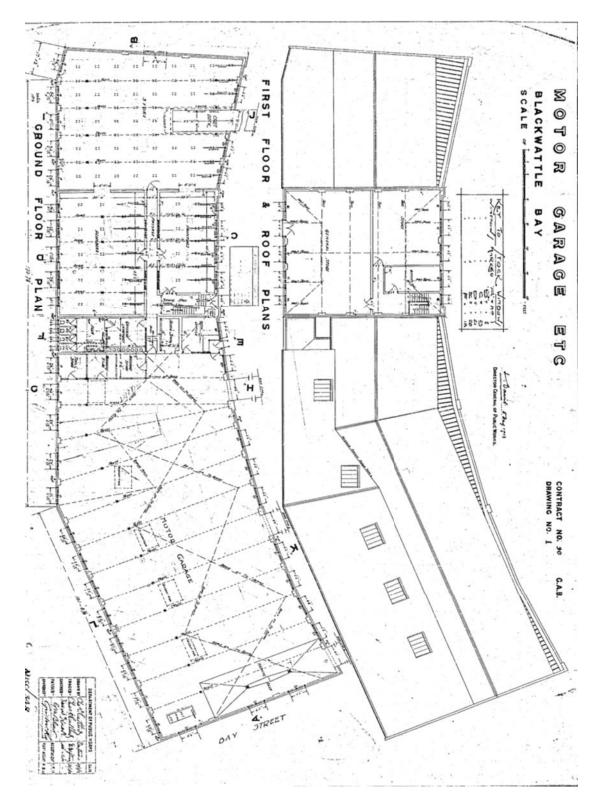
Floor plans of the State Motor Garage. Design by the Government Architects Branch of the NSW Public Works Department in 1913. The building was completed in 1914
